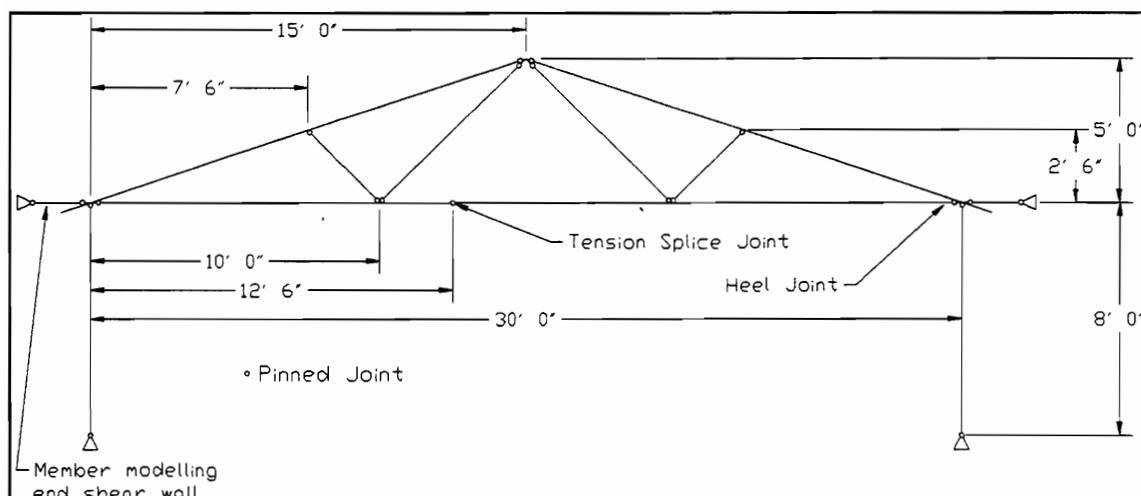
Dimensions and joint connectivity of the Fink truss modeled in SAP90 for this project
